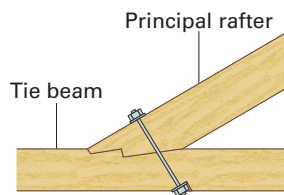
Making the tie beam / principal rafter joint more secure using a bolt
